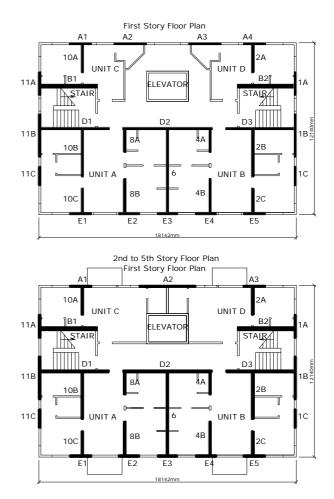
Denomination and location of shear wall at storey 1 and 2-5
